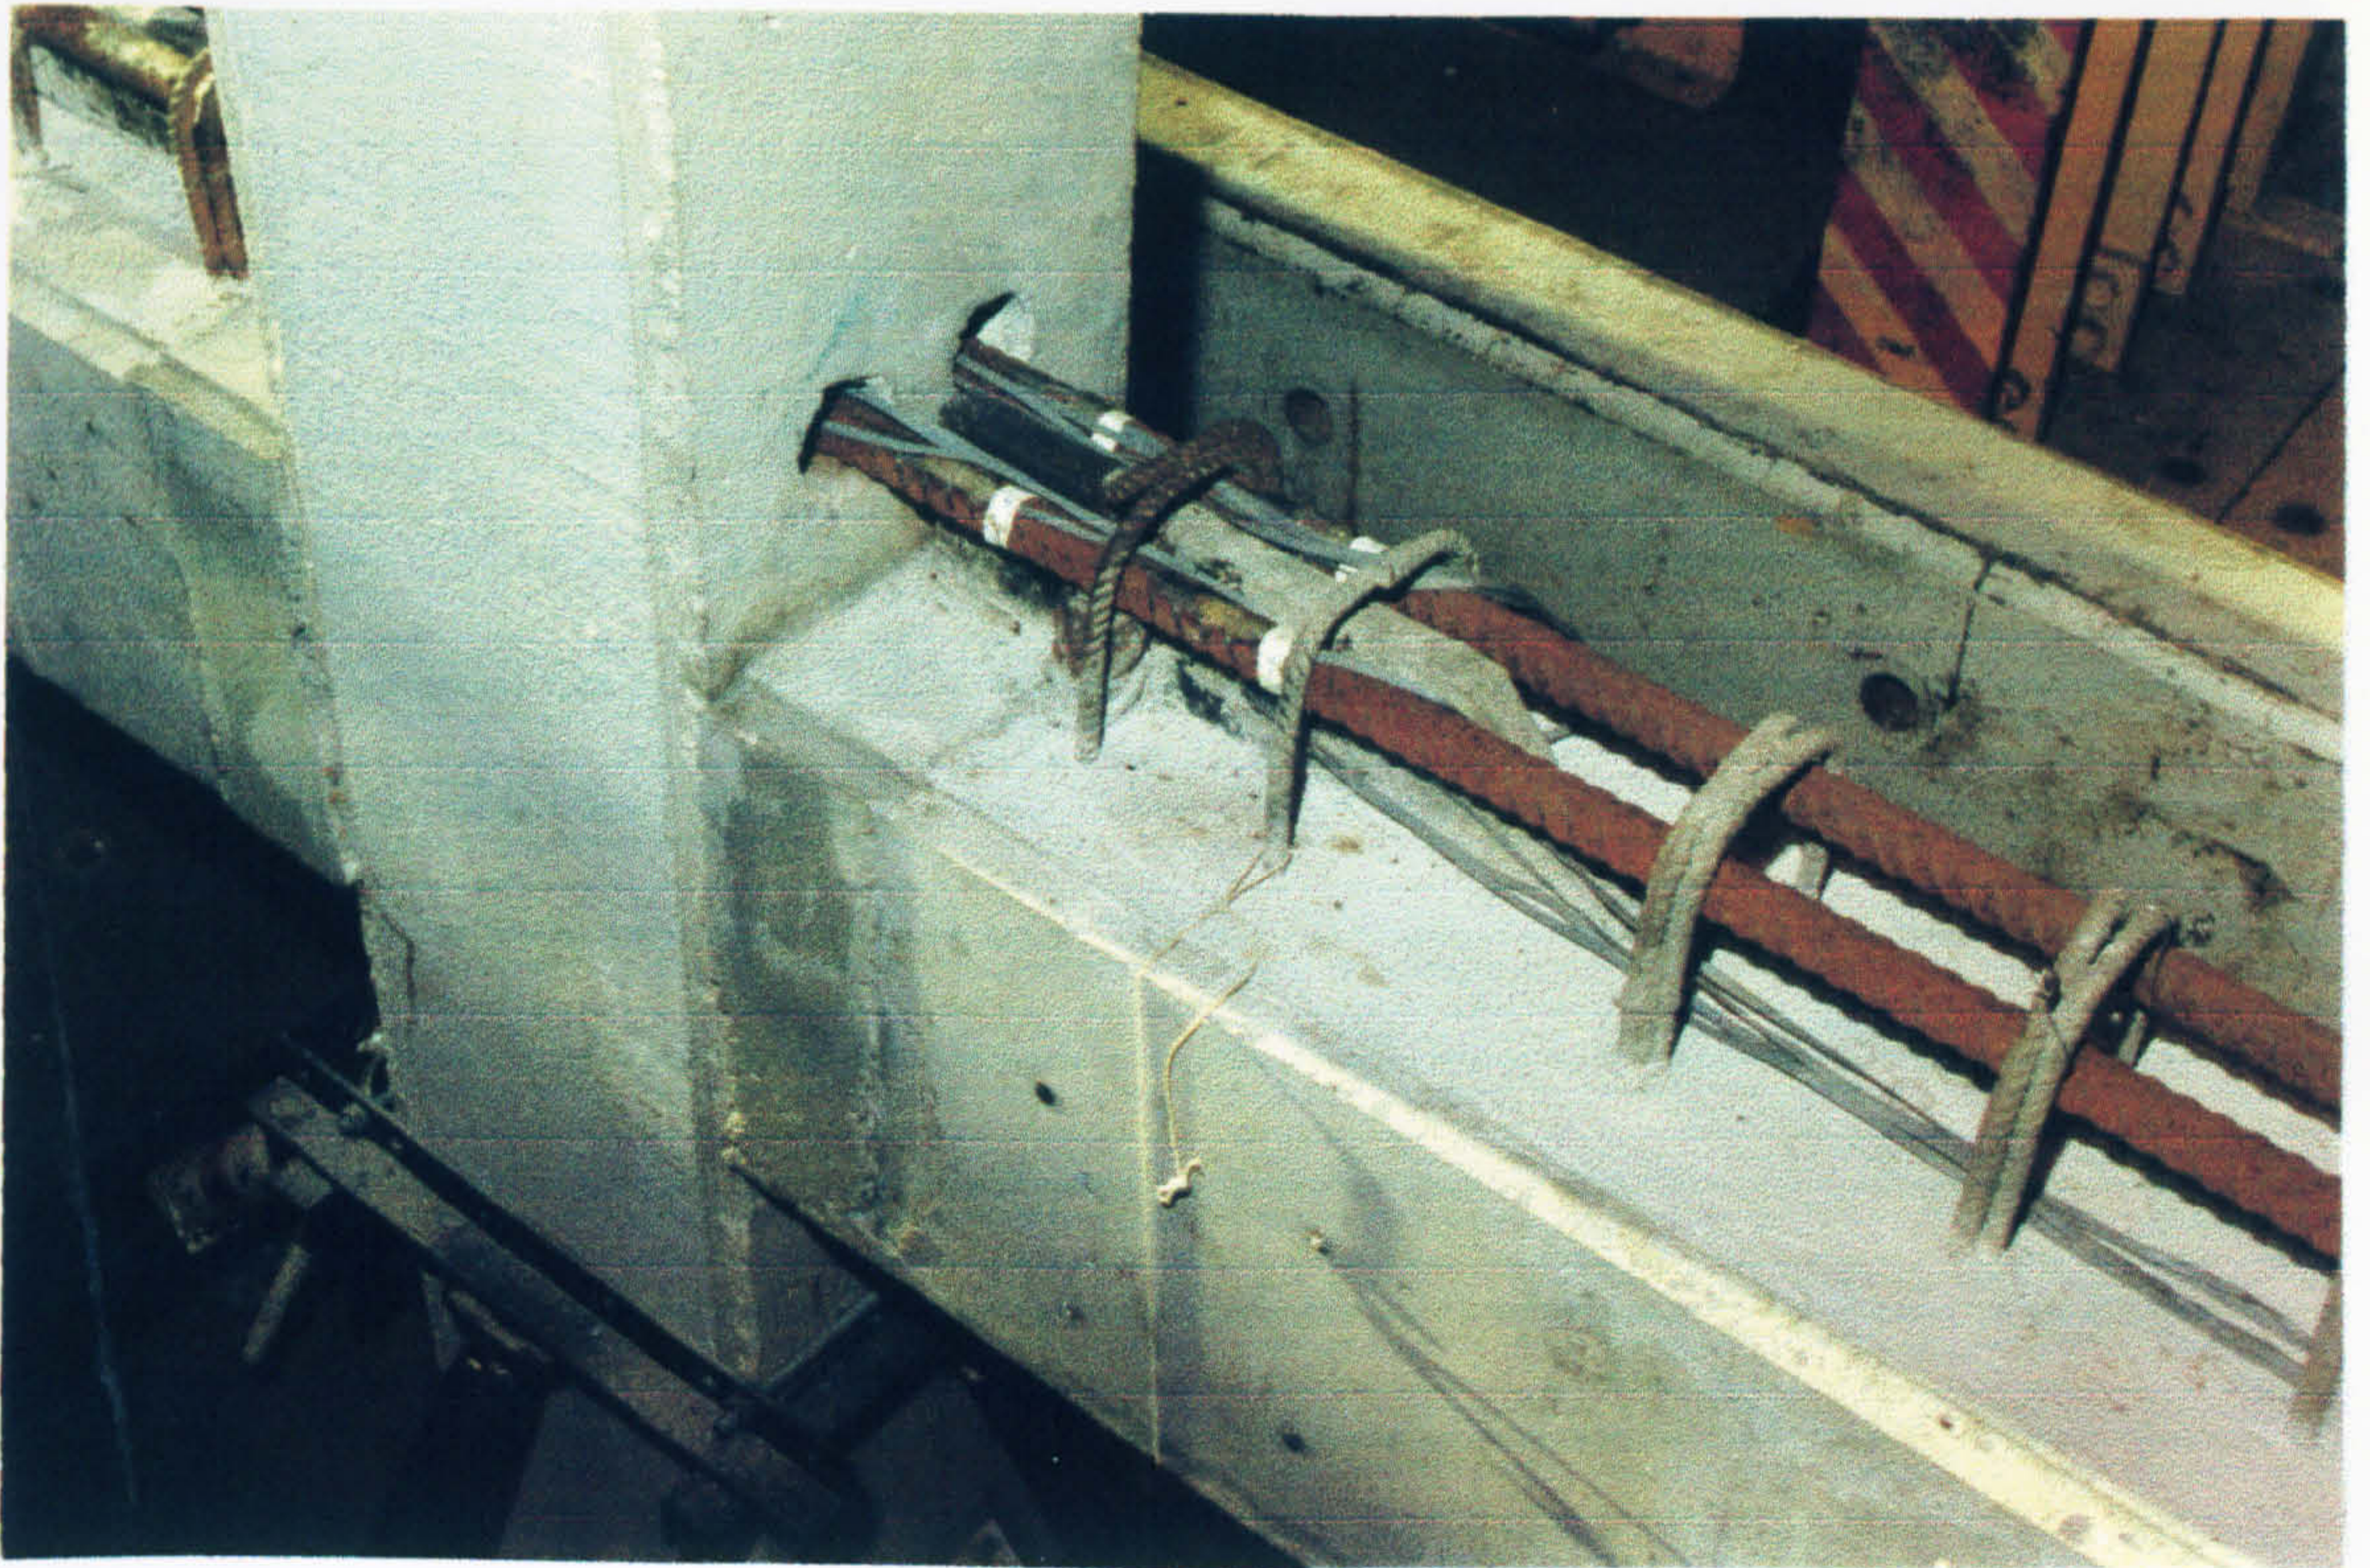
Location of stability tie bars with steel strain gauges for subframe SF1
